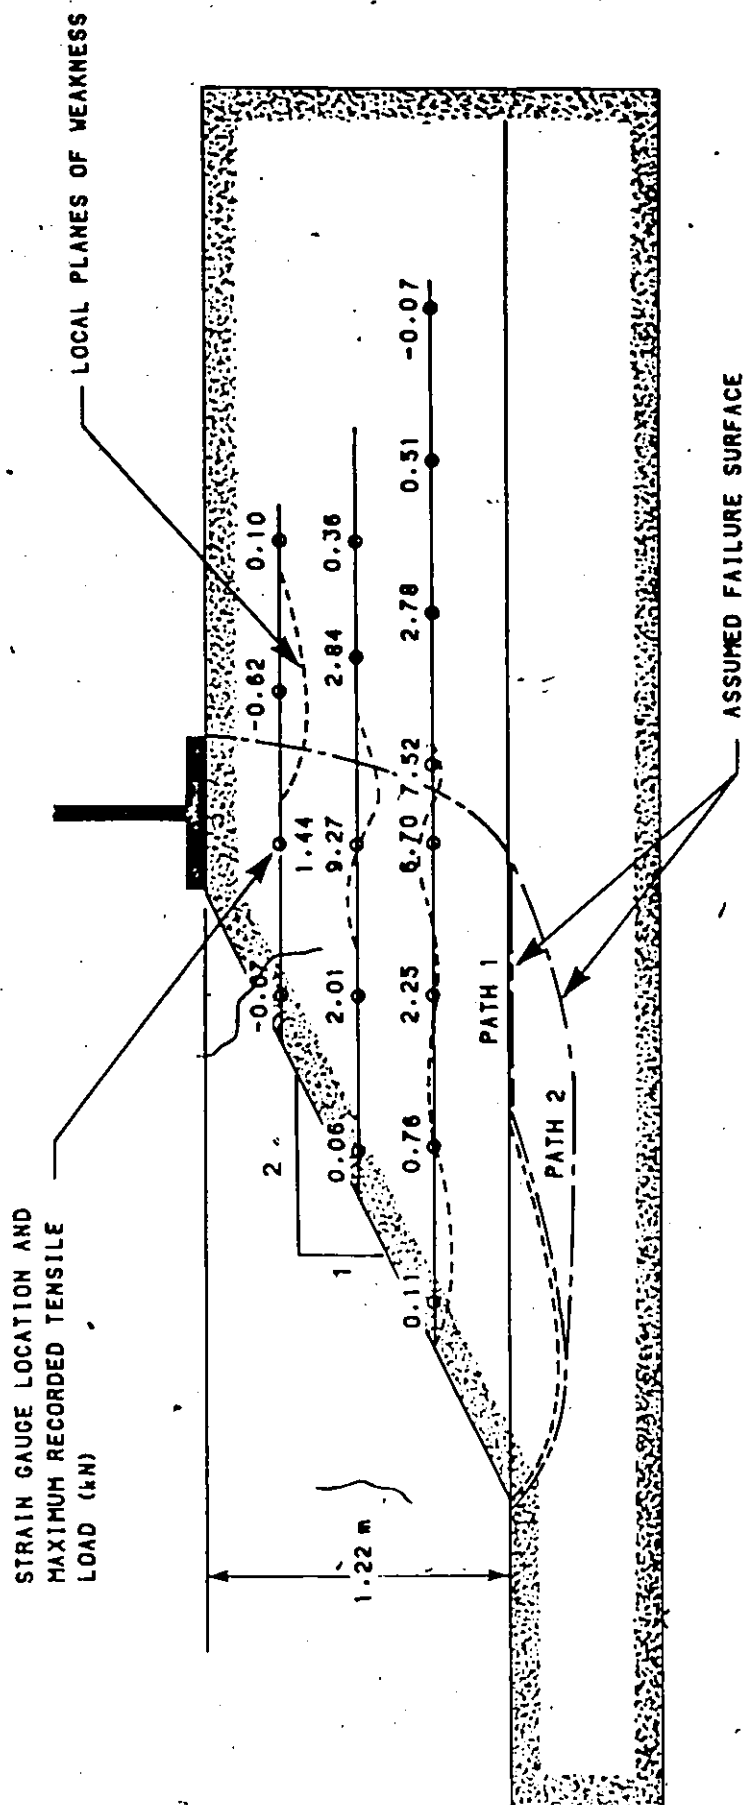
ASSUMED FAILURE SURFACE OF EMBANKMENT #2
